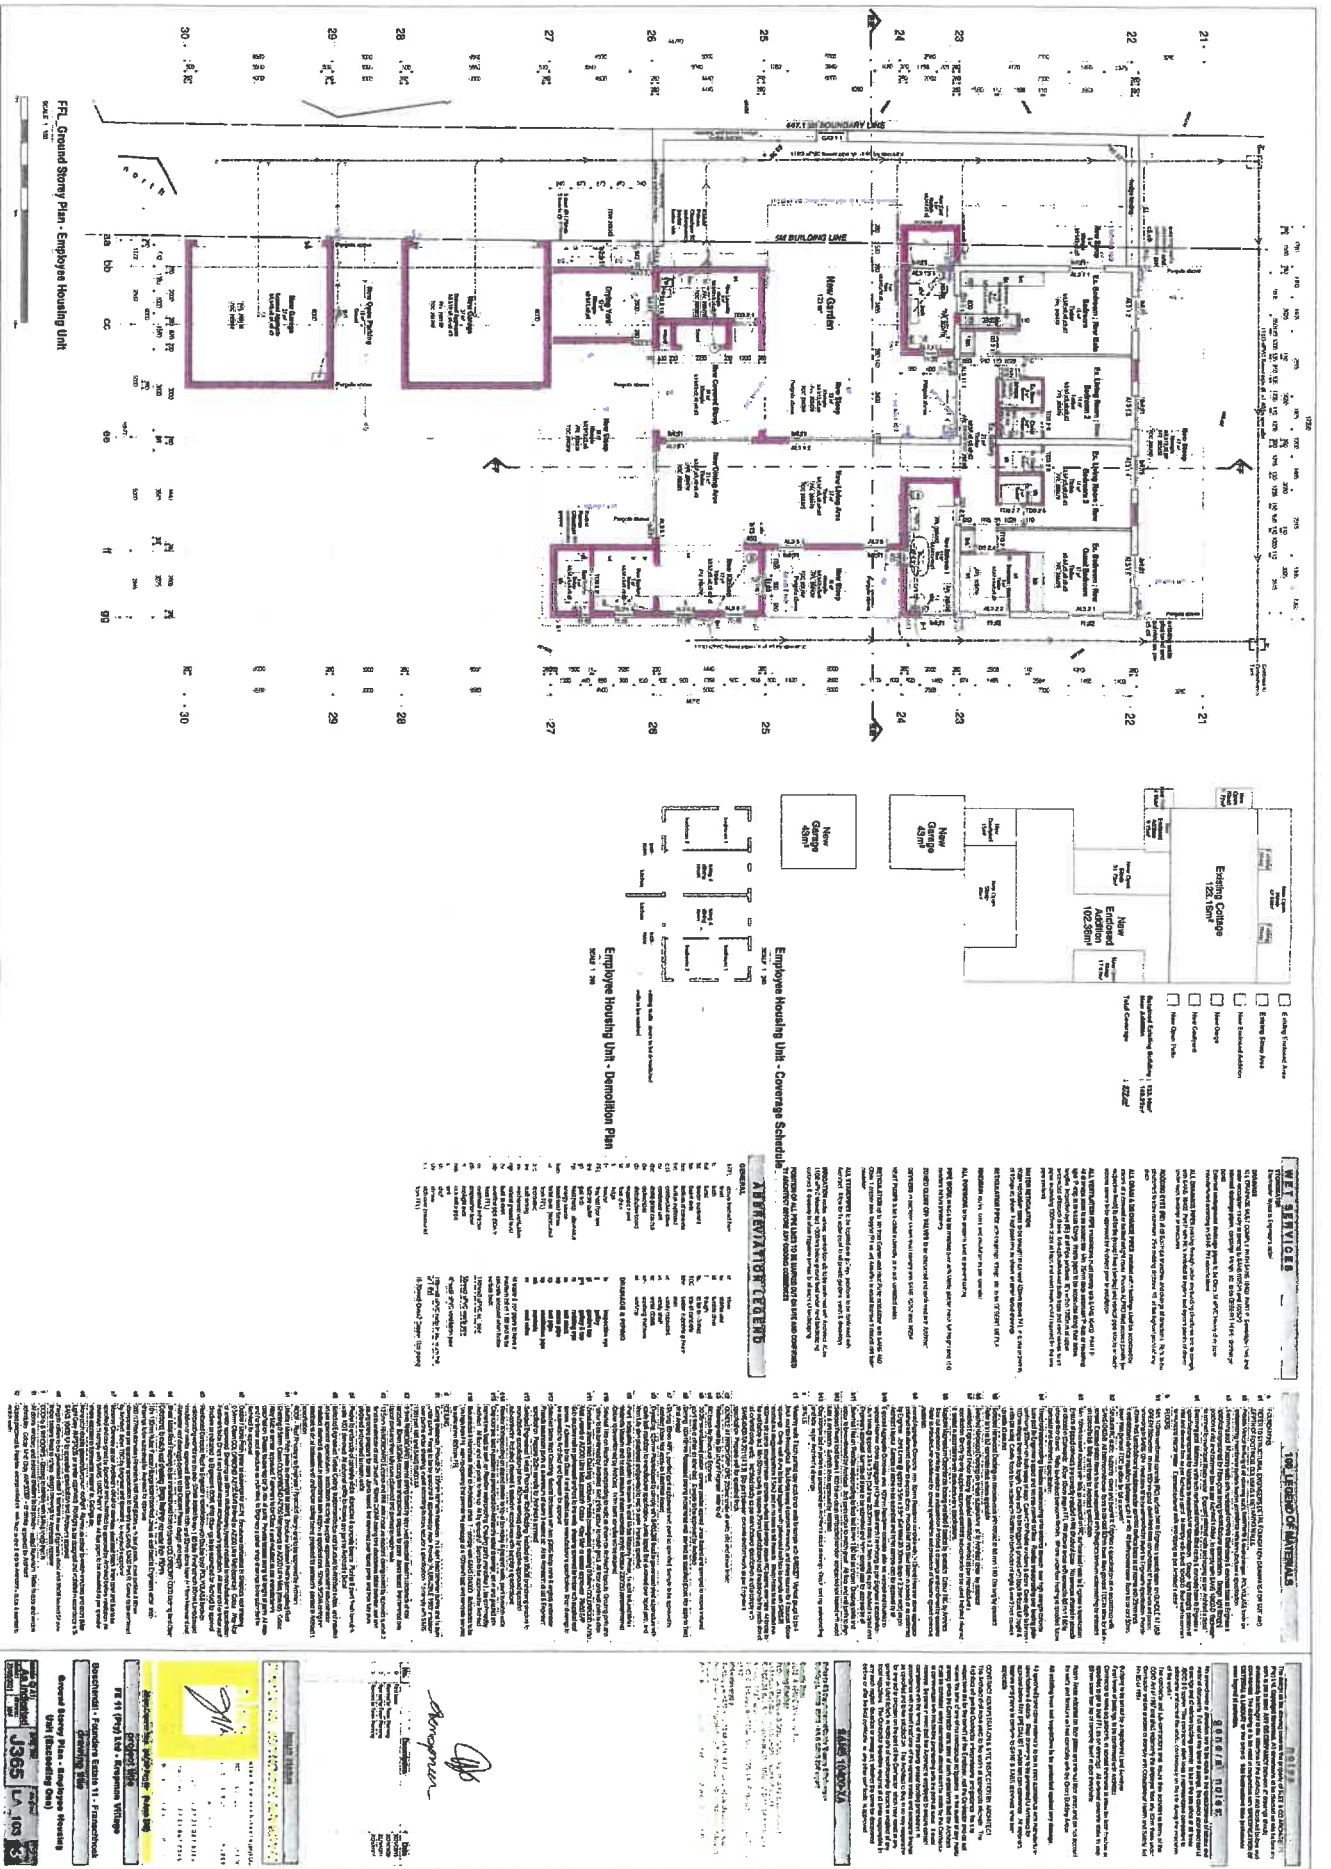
Employee Housing Unit (Exceeding one unit): Floor Plan (Source: Slee and co. architects)
